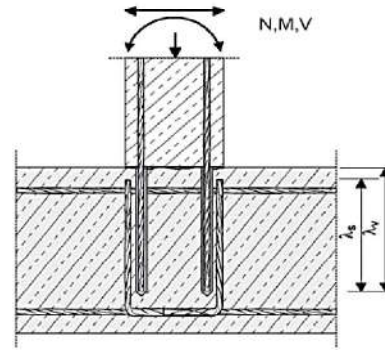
Overlap joint at a foundation of a column or wall where the rebars are stressed in tension.
